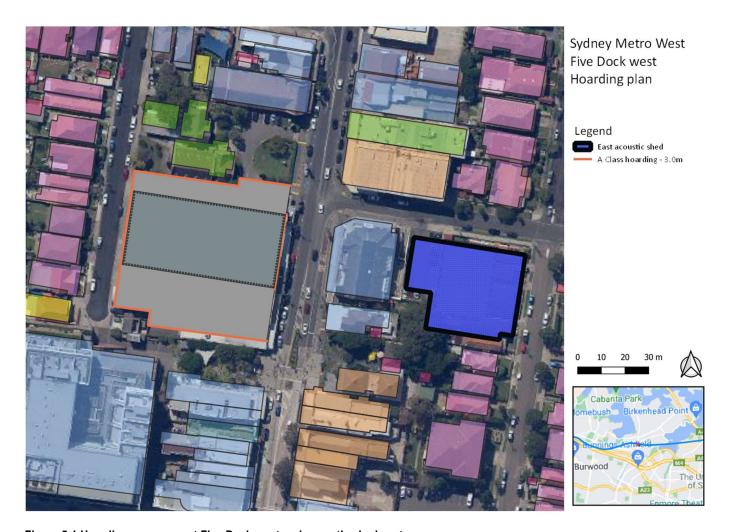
Hoarding arrangement Five Dock west and acoustic shed east
